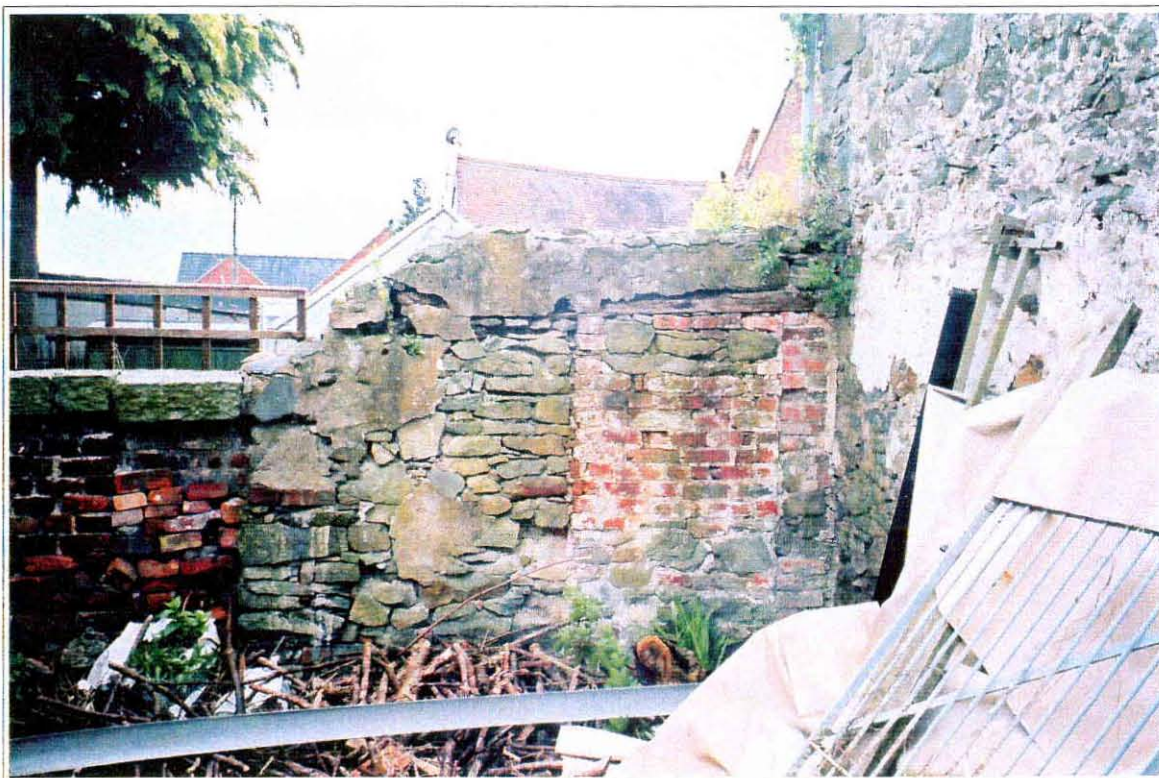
East wall of former lean-to on north wall of existing building to rear of No 22 High Street.
